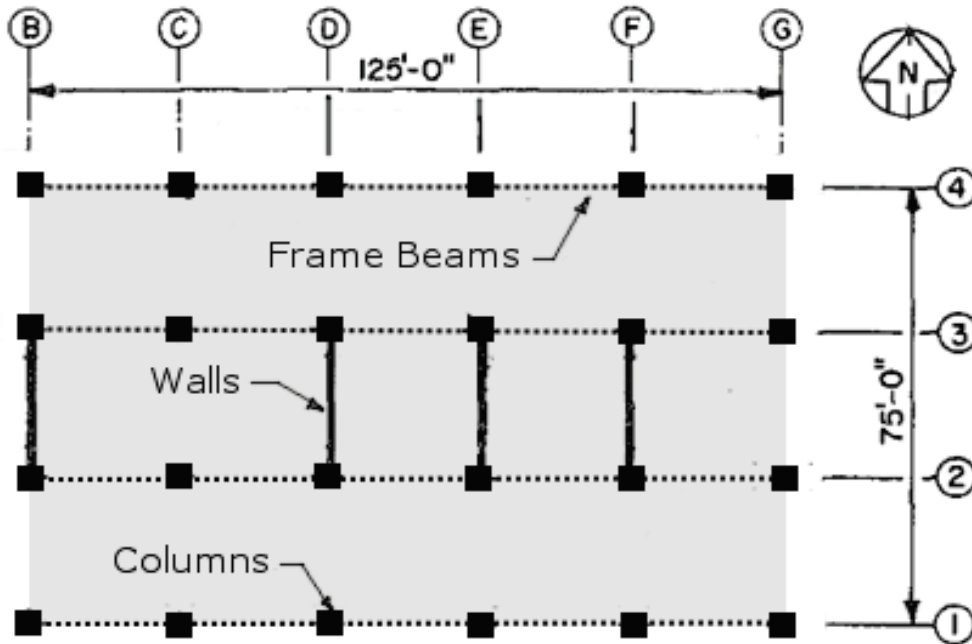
Plan view of study building, showing location of first-story walls (modified from Kreger and Sozen, 1990).
